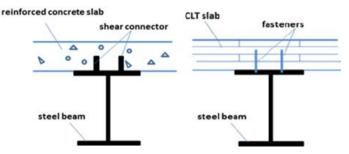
(a) Floor systems of tall building RC slab floor system (left) and (b) floor systems of tall building (right).
